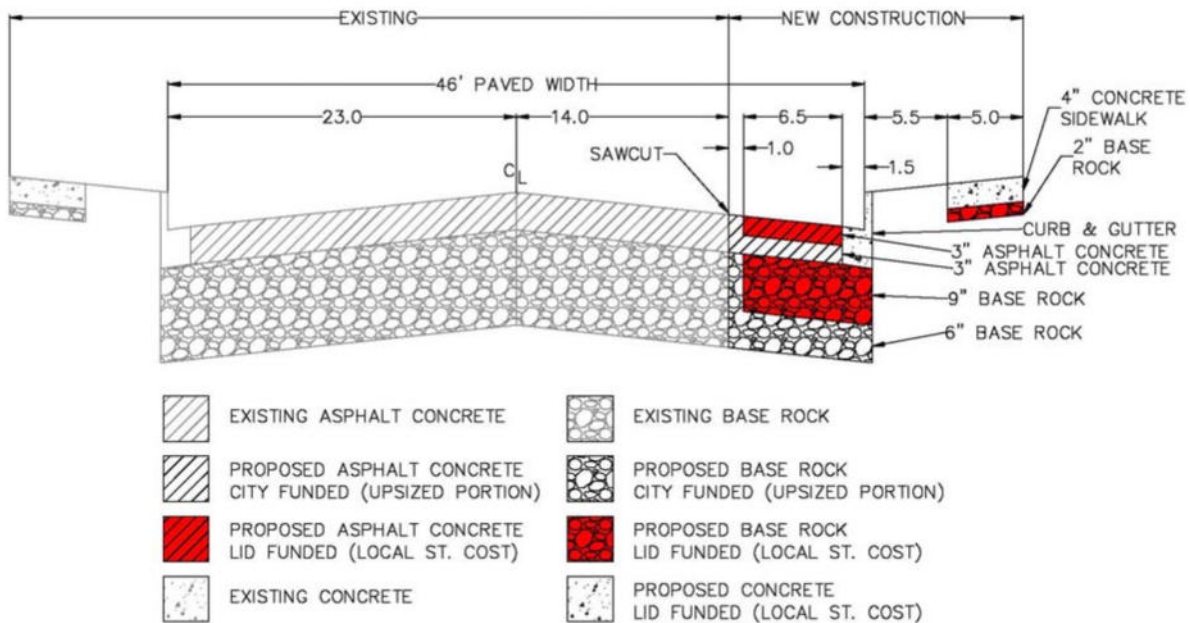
GROUP C CROSS SECTION (SECTION IS LOOKING SOUTH)
